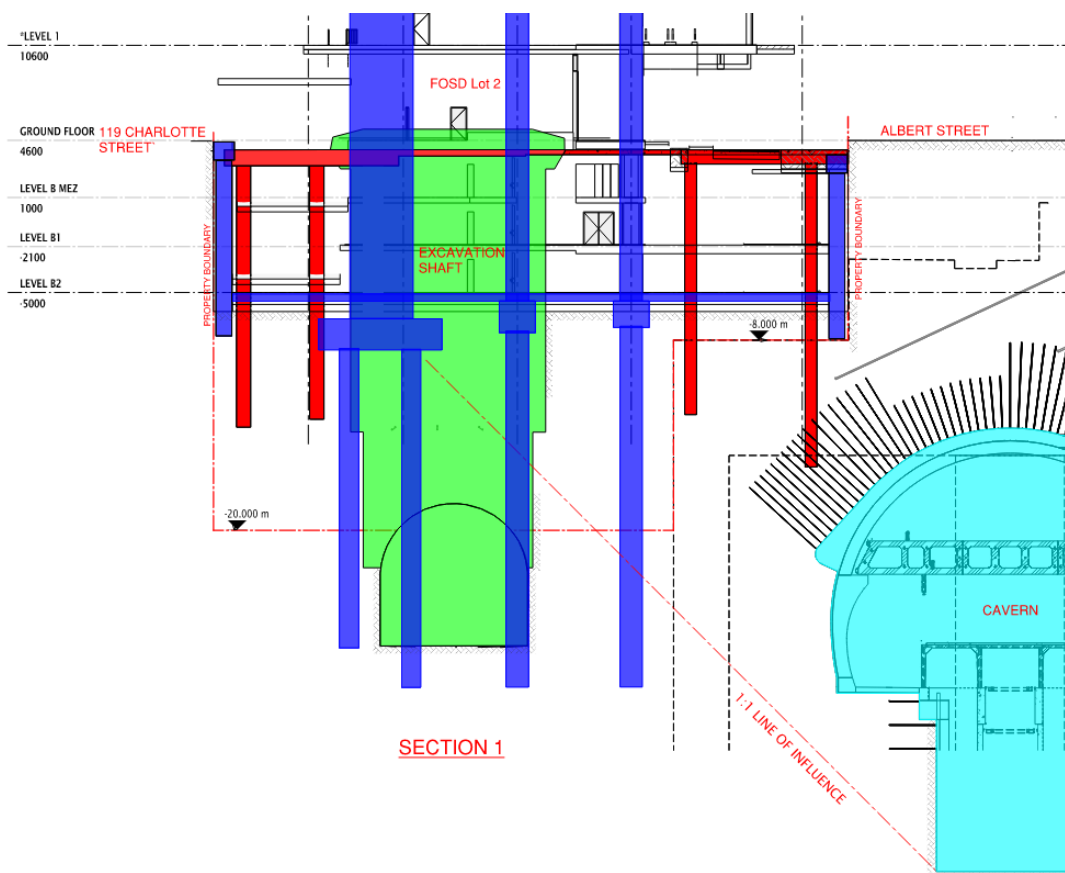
CRR Asset and Proposed Development Structure Proximity Section
